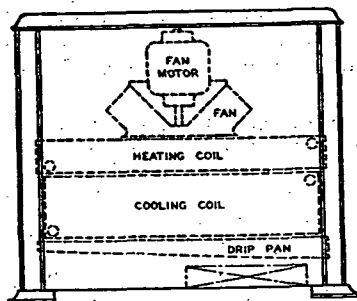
REMOTE FLOOR TYPE ROOM UNIT AIR CONDITIONER
